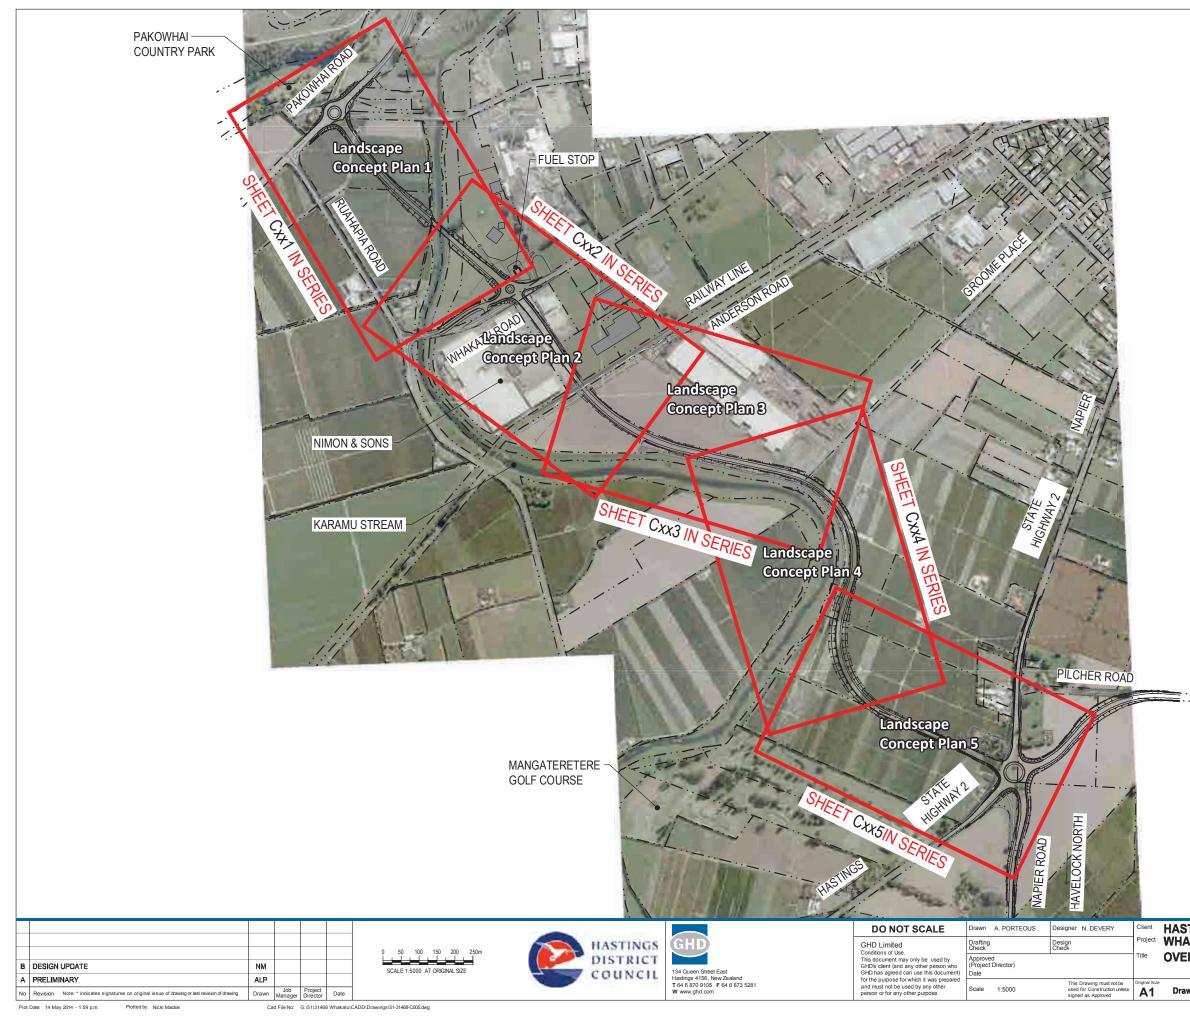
Whakatu Arterial Link Route Overview Plan
